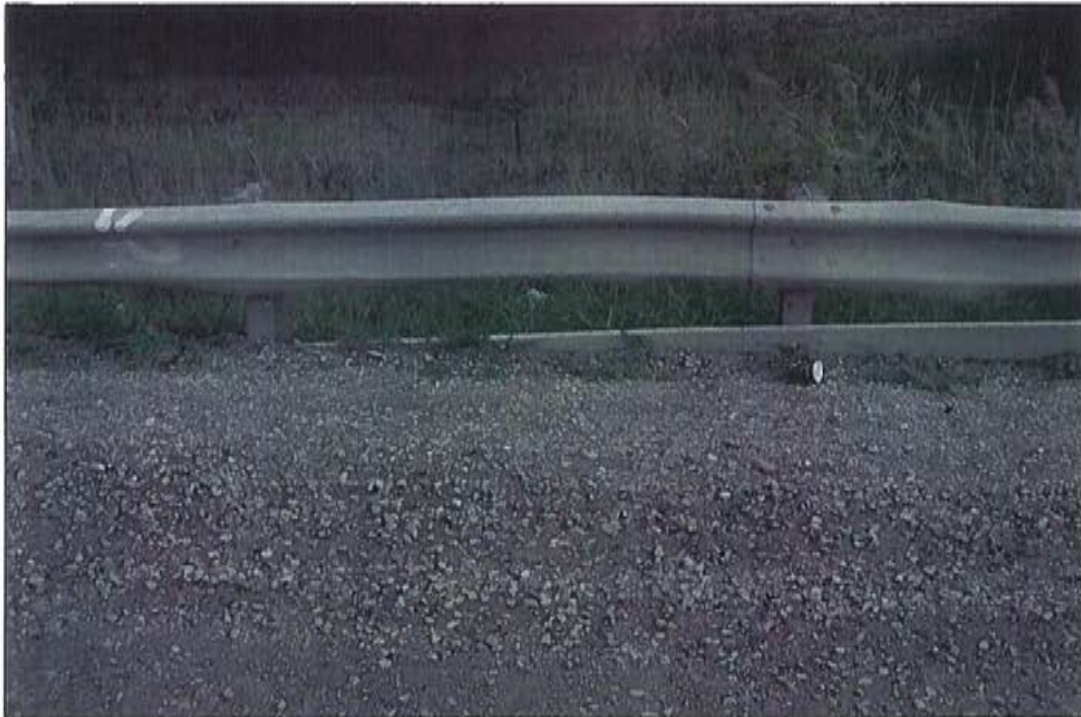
Steel beam guide rail, east approach, south side: impact damage.
